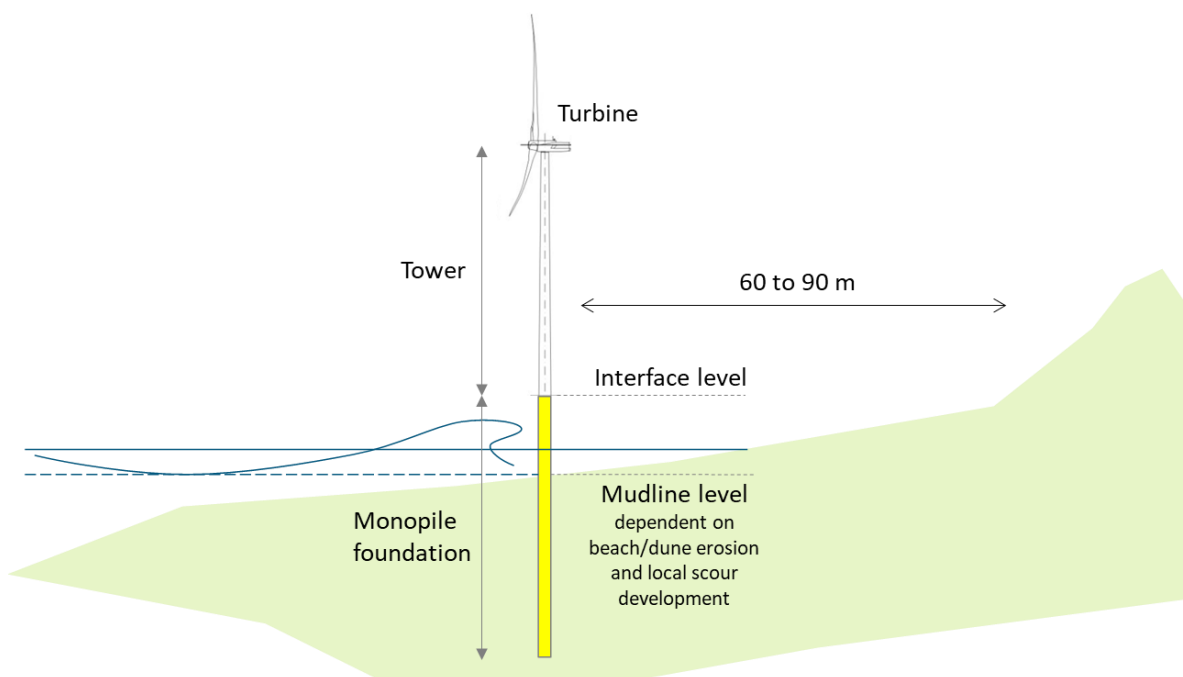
Wind turbine with monopile foundation concept in MV2 Soft Sea Barrier
